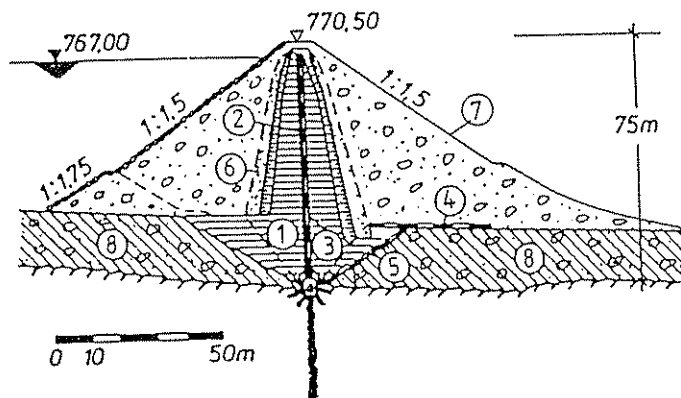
Right abutment section of Frauenau rockfill dam with earth core and trench diaphragm (adapted from List 1987).
